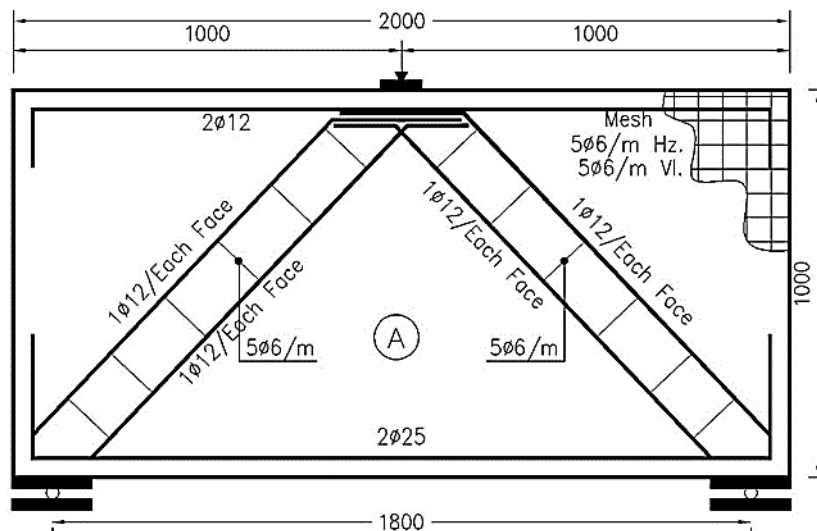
Details of control specimen Beam A. (Dimensions are in mm)
